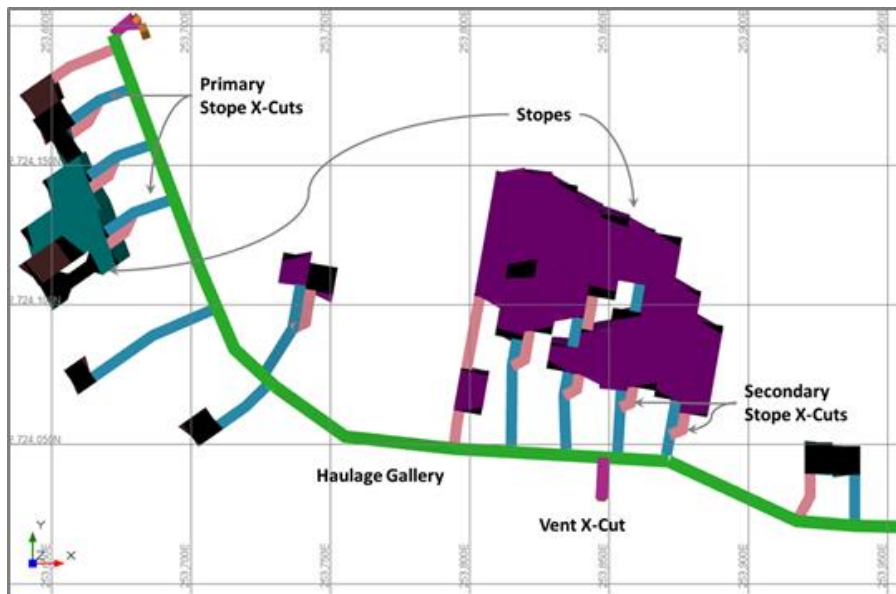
Plan View of Typical Level Development Configuration (MXS/MXN Zone)
